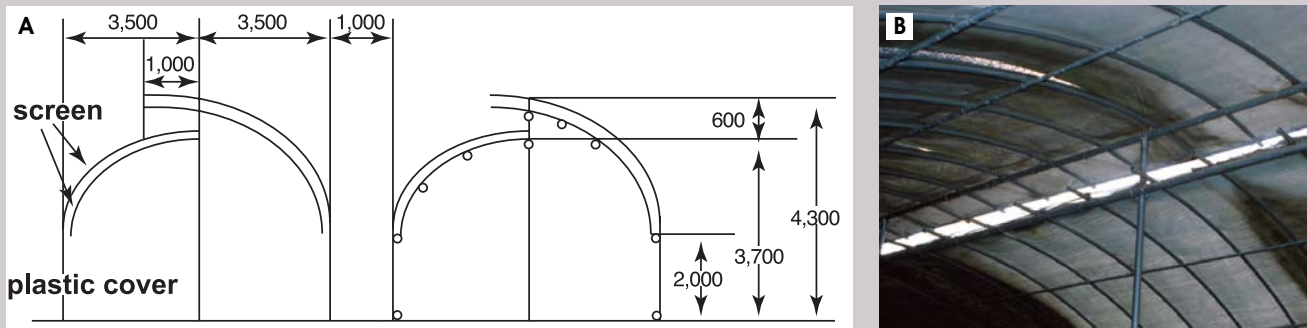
Overlapping open roof house A: A plan of overlapping open roof house B: The overlapping open roof seen from inside growing house
